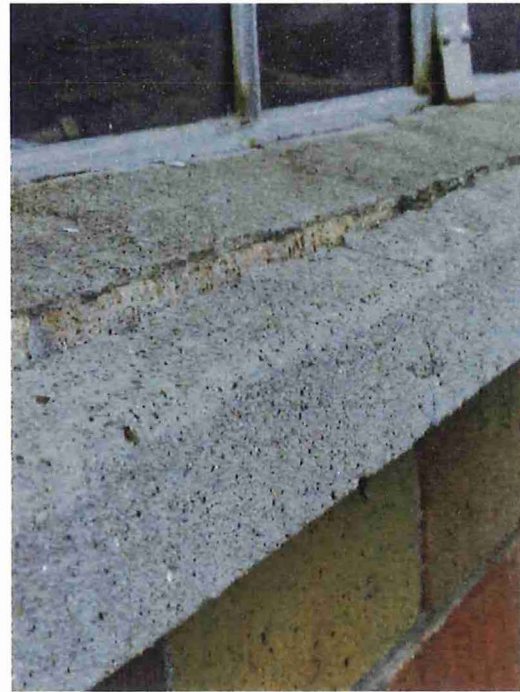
south elevation - typical detached window sill & rusting mullion (background)
